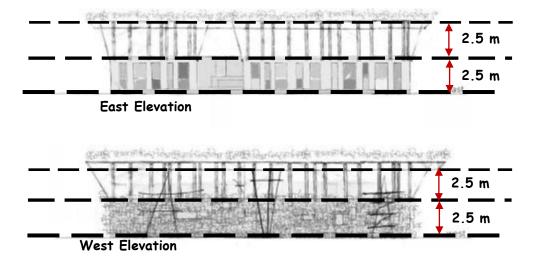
East & West elevation: Project is a horizontal development (ArchDaily, 2010)
